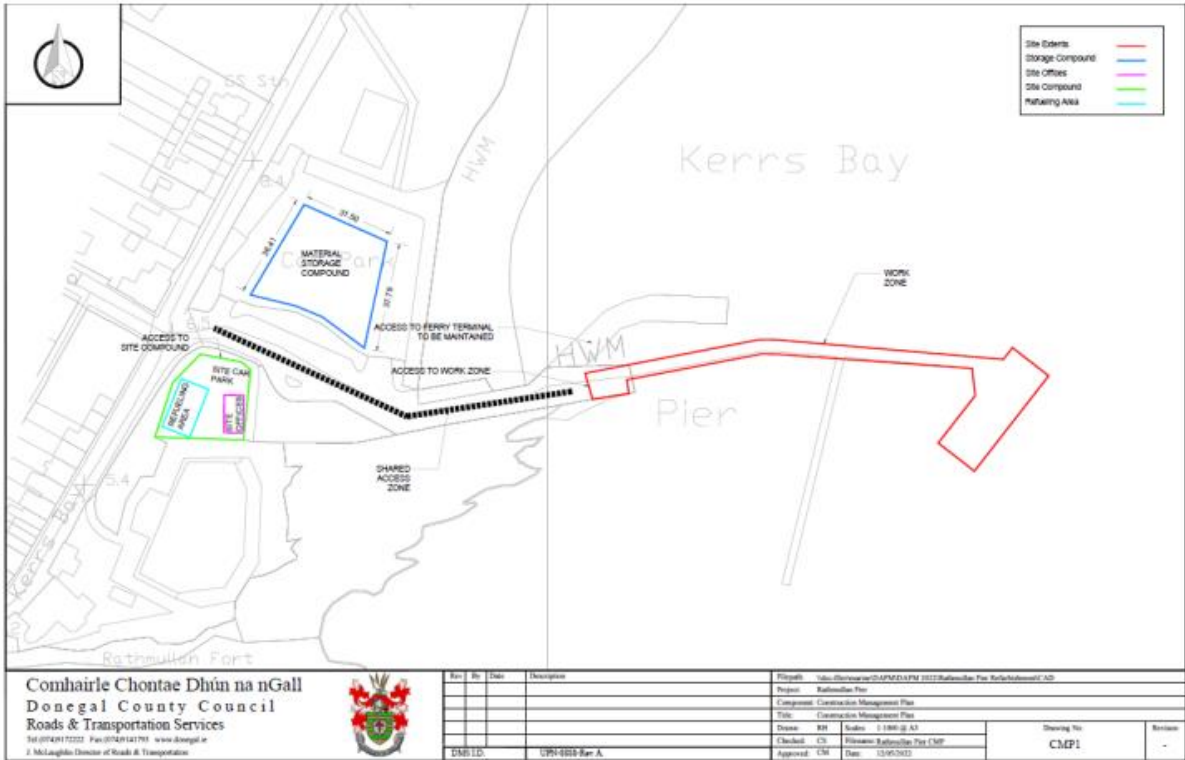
The proposed project site layout, project in red. Design Plan Map (from applicant documents).
